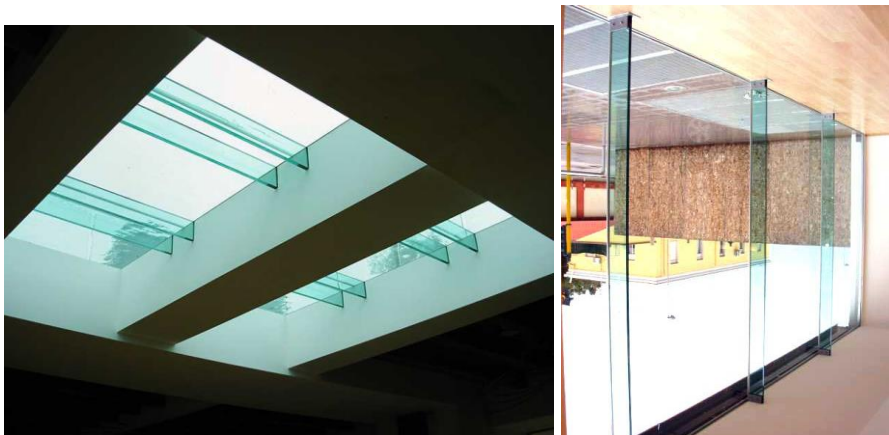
Example of glass beams, used in a rooflight or as fins.
